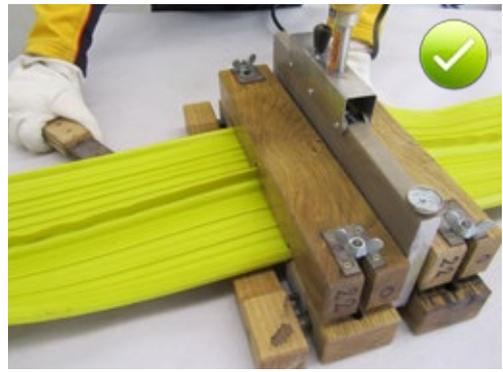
Melting the waterbar ends by pressing them both against the hot welding blade with the lever closing mechanism
